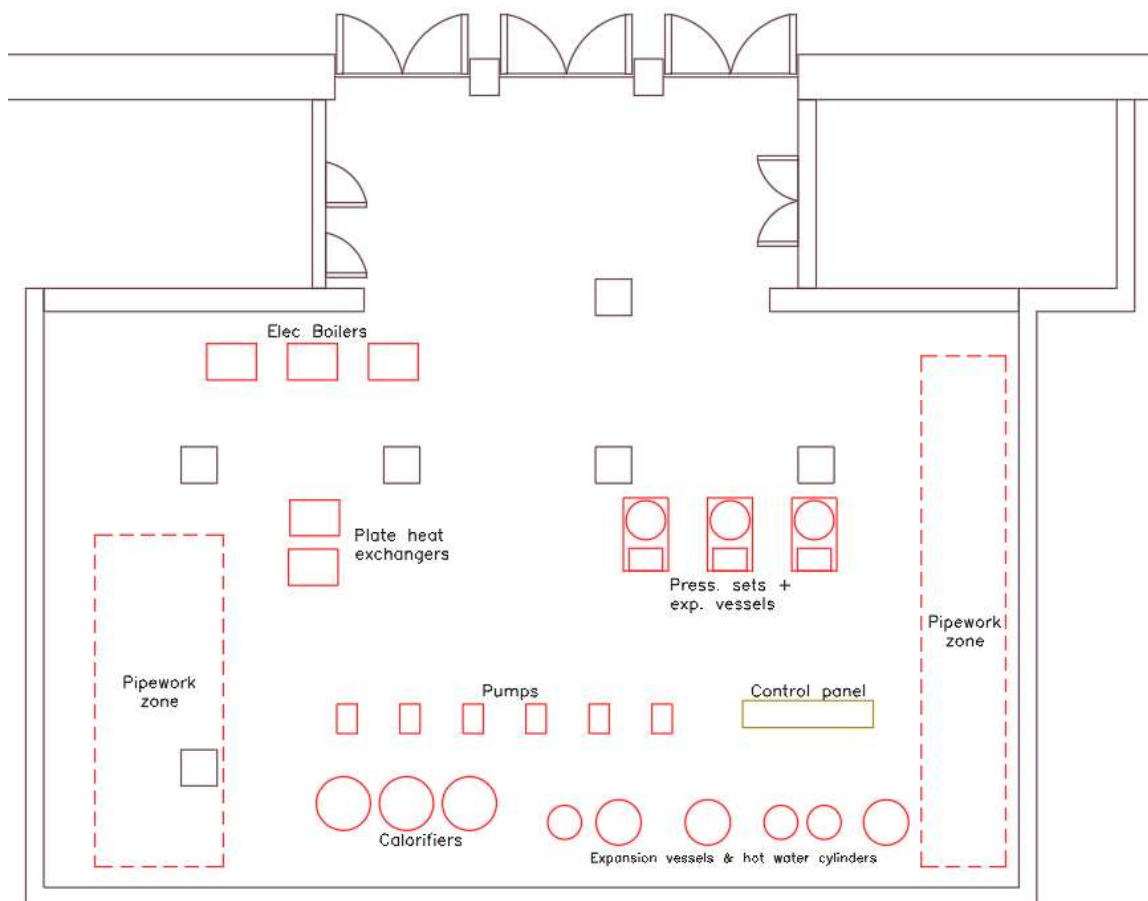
Heating plantroom for Silver and Gold packages, removing all gas boilers
